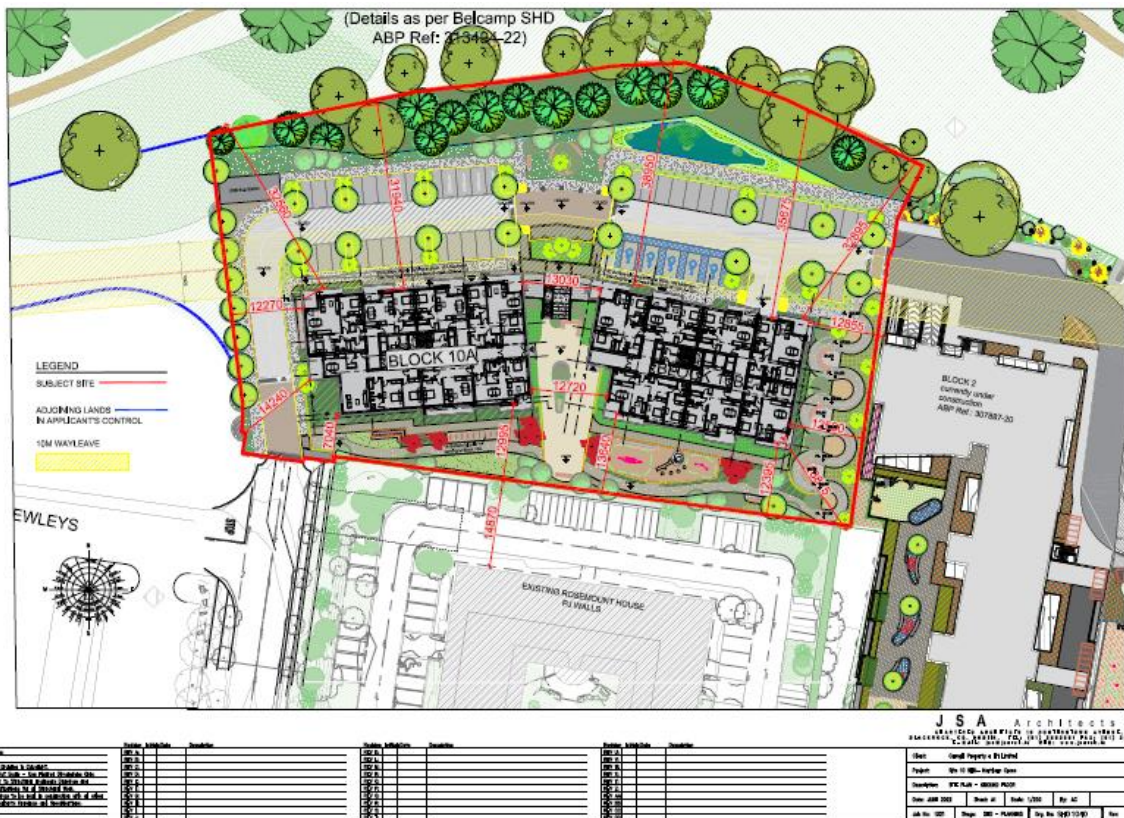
Site Layout Plan (JSA Architects, August 2022)
